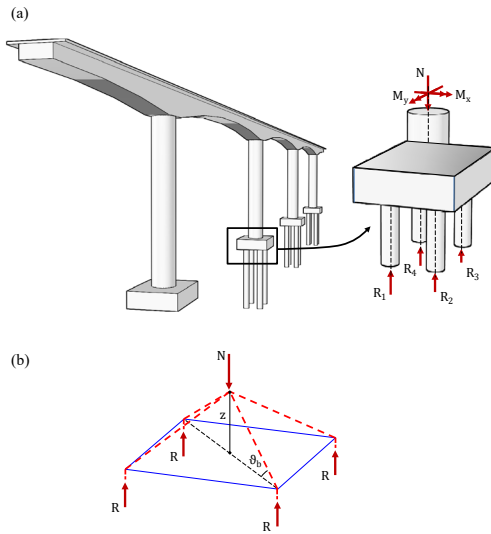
a) Pile foundation of a bridge subjected to generic load; b) STM for centered load
